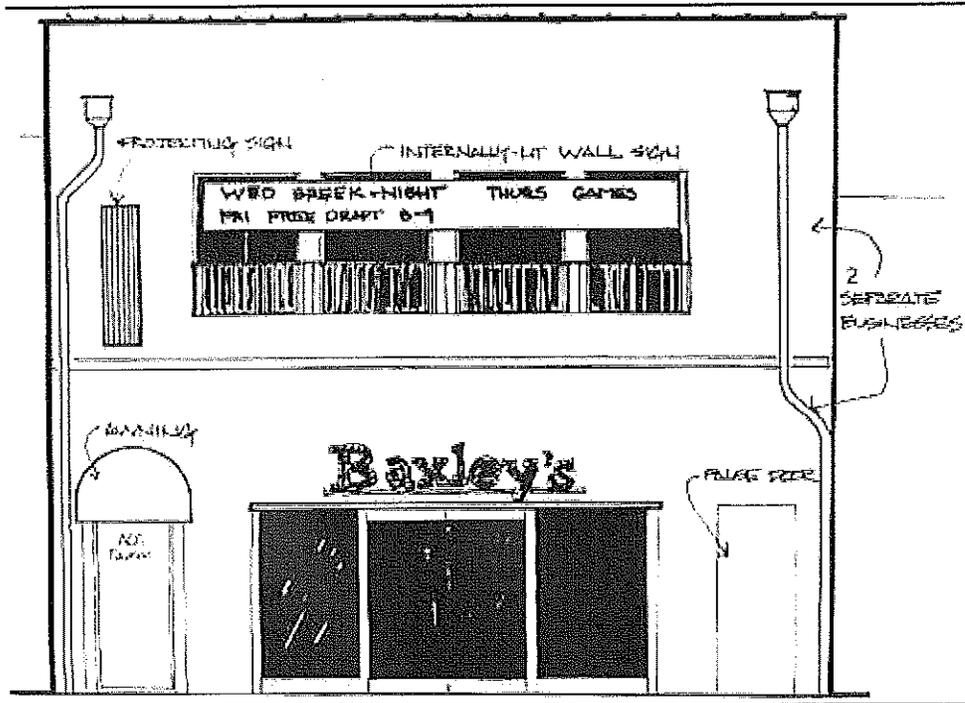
EXISTING UNIVERSITY FAÇADE
